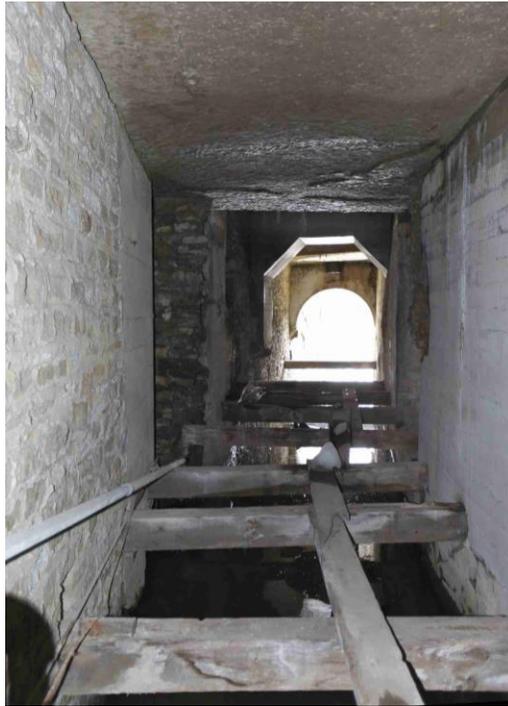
Downriver tailrace northeast channel looking out towards river. Photograph by Arch³, LLC., April 2014.
